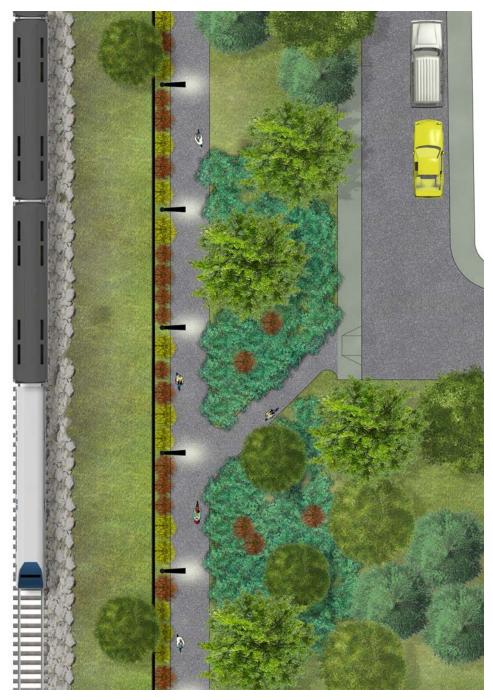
This plan rendering shows the separation of space between the tracks and the trail and how the trail can connect to existing streets.
